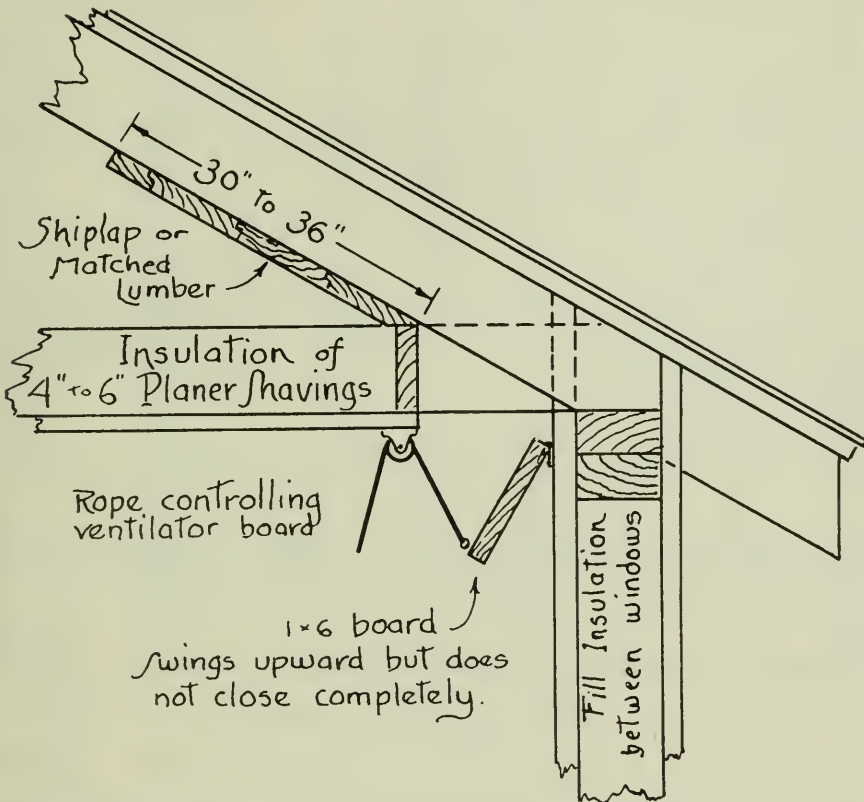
Construction detail showing ventilation opening and shutter, also the shield over ventilating slot as required in the lower storey of a double deck house.
